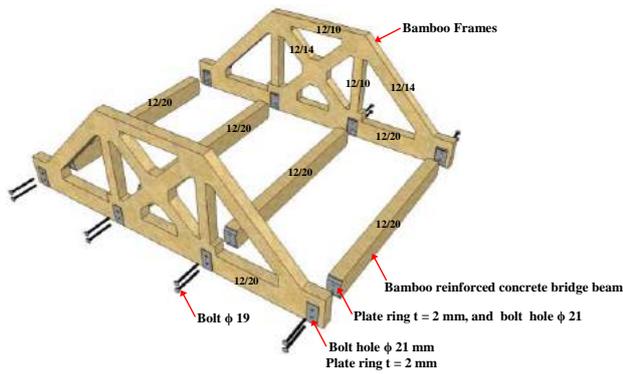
Model of the precast bridge made from bamboo reinforced concrete.
